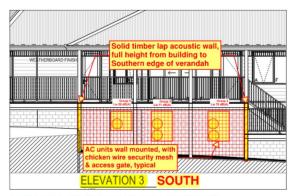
AIR CONDITIONING - GENERAL ARRANGEMENT SOUTH
